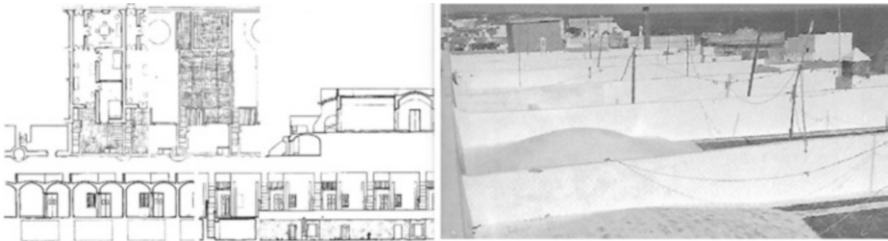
Row houses in Fuzeta, Olhão—plans, sections, elevation, and “Açoteias” (AAP 1961)
